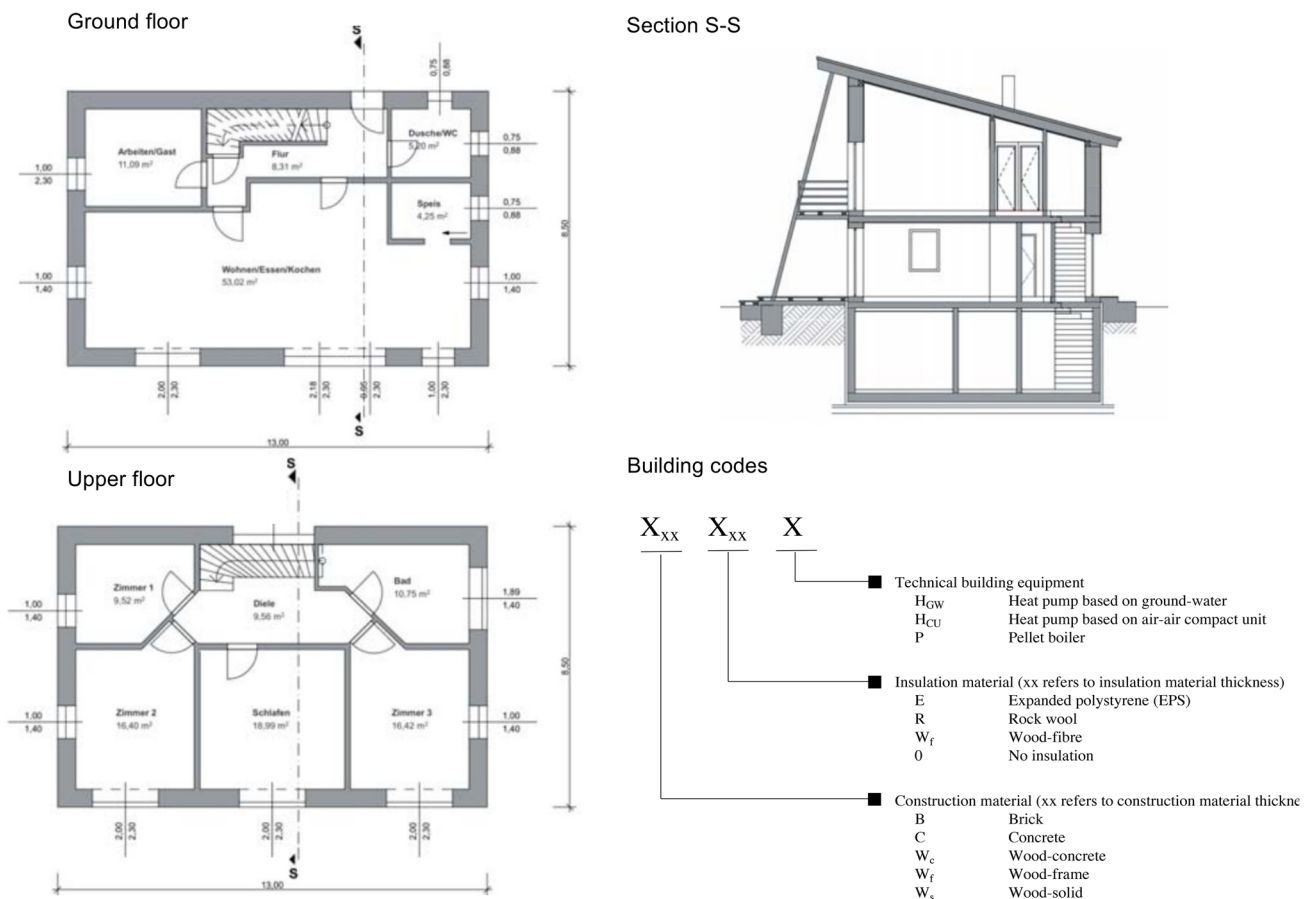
Floor plans and cross section of the two-storey residential building and explanation of the defined building codes (Sölkner et al. 2014b; Passer et al. 2016; Scherz et al. 2022b)
